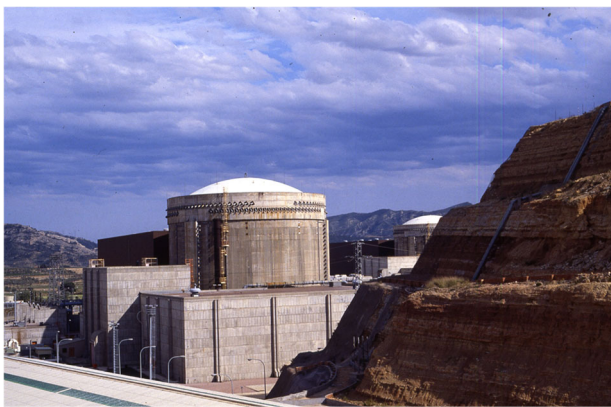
Containment building and excavated slope in the Tertiary claystone.
